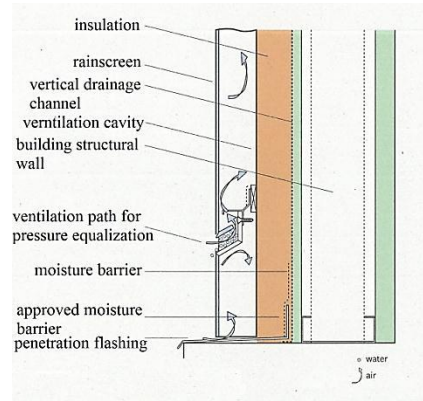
Vertical section through a typical horizontal joint detail in pressure-equalised rainscreen. (Robert and Guariento, 2009).
